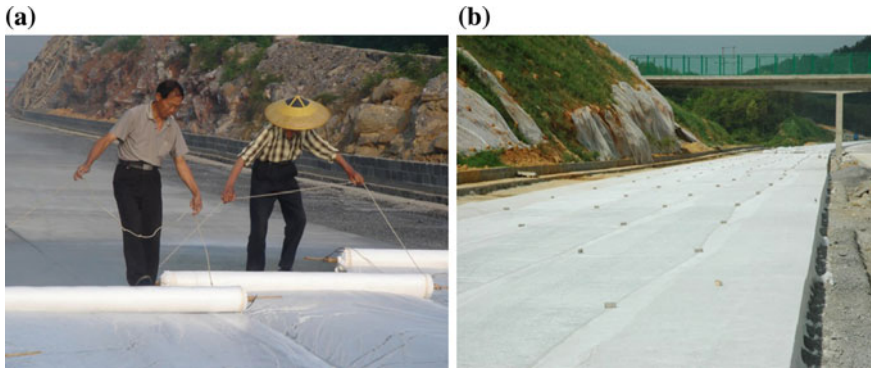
Construction of curing cement concrete pavement with the new-type curing membranes
